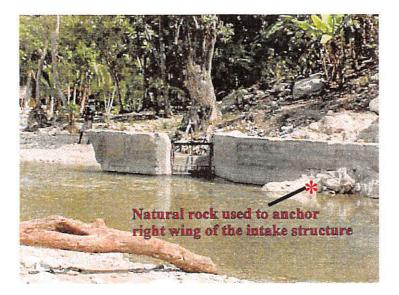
Intake structure at the Rodaille site. Note that the natural rock on the right wing which was used to anchor the structure. The right wing survived the flooding due to the anchor. It is a good idea to anchor an intake structure to a strong object such as natural rock. In case no such object is found, an artificial structure similar to natural rock may be located at more convenient and proper location for intake structure. Existence of such anchoring object should not govern the location of intake.
